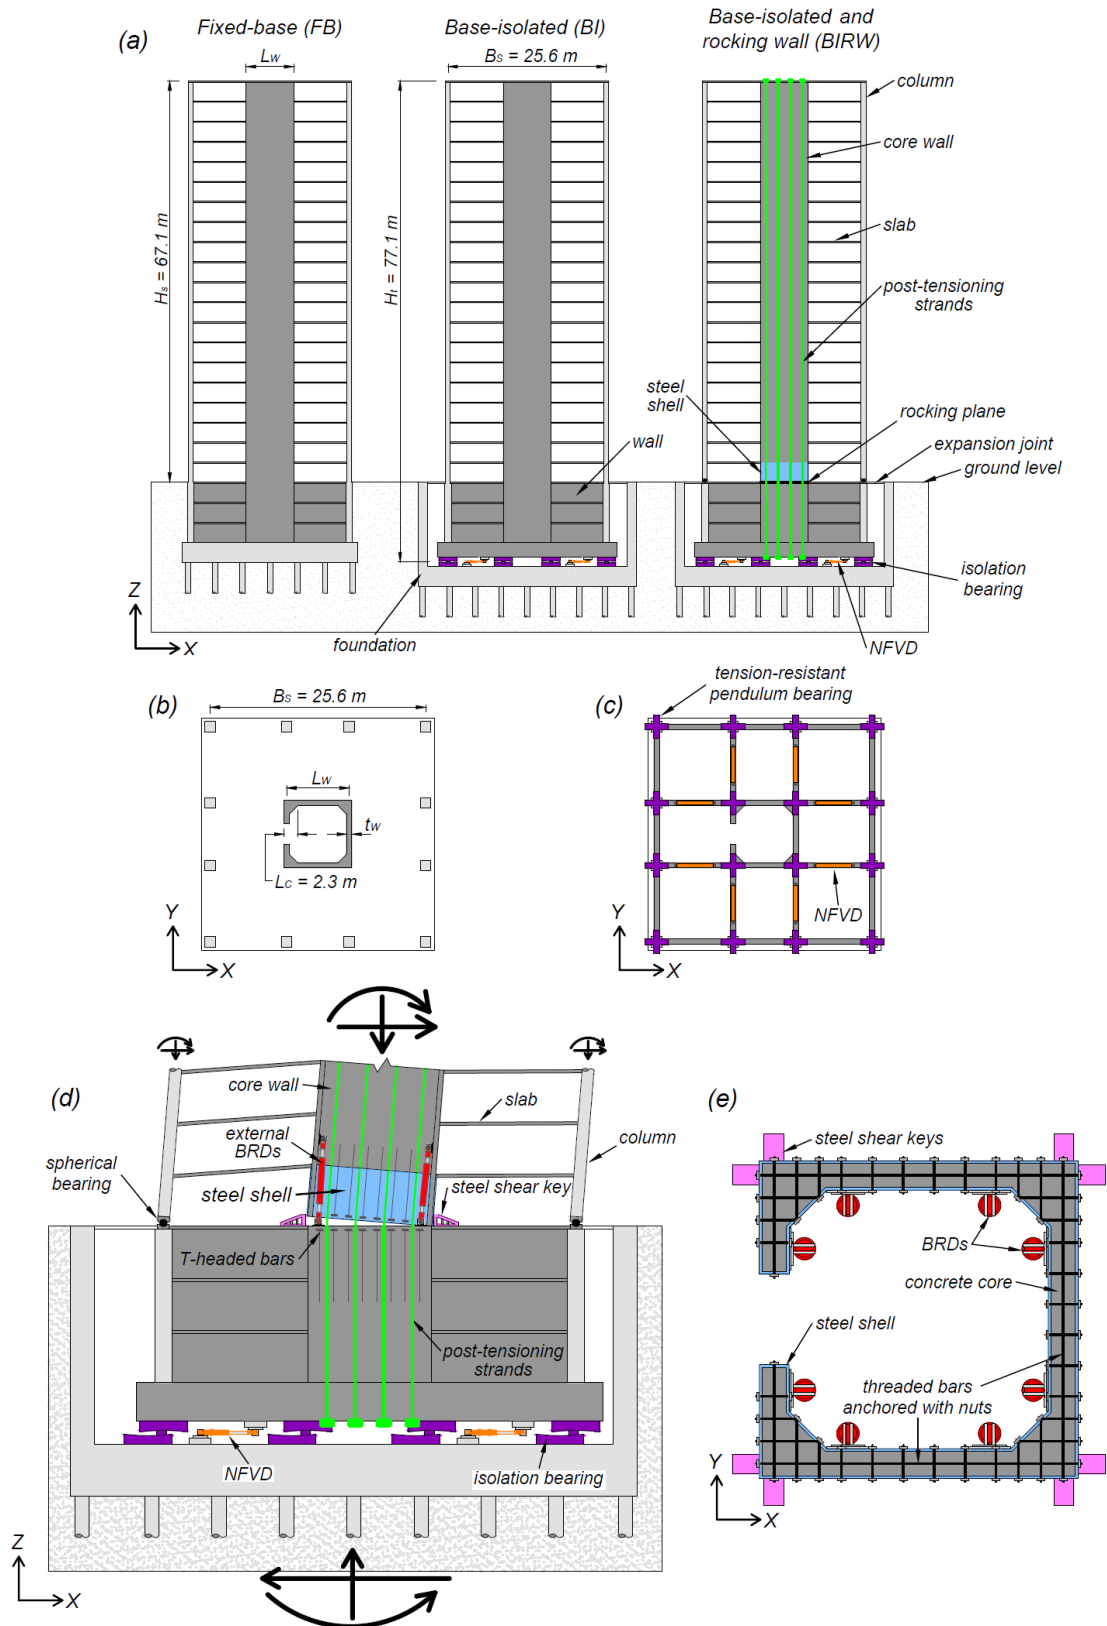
(a) elevation view of the FB, BI, and BIRW buildings; (b) plan view of the BIRW building above ground; (c) plan view of isolation system (BI and BIRW); (d) elevation view at deformed state of the bottom part of the BIRW building; (e) Plan view of the rocking plane of the BIRW building; reinforcement embedded in the section is not show for clarity.
